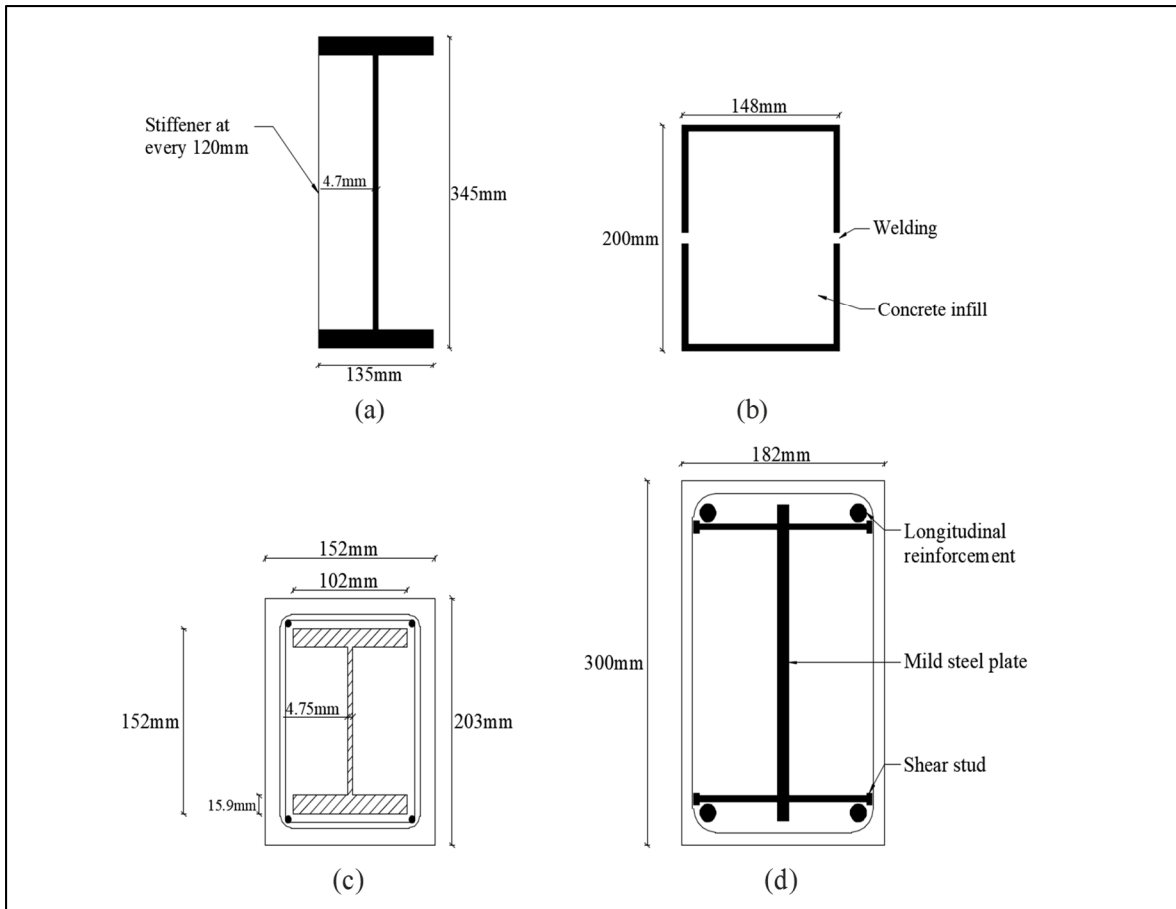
Alternative designs of CBs: a) steel coupling I-beam with stiffeners; b) steel CB with concrete encasement; c) concrete-filled steel-tube CB; d) steel composite CB with shear studs (adapted from Lam et al., 2001)
